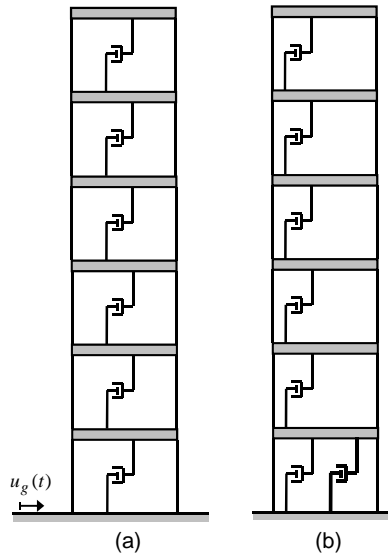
Six-story shear building model: (a) bare frame; (b) frame with a supplemental damper in the first story
